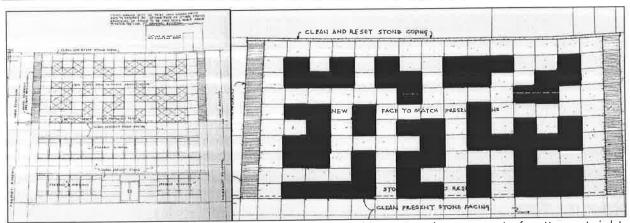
South elevation with ornamental stone panel layout, enhancement of pattern at right (Gerald Griffith, architect, July 1956, in the possession of the building owner)
